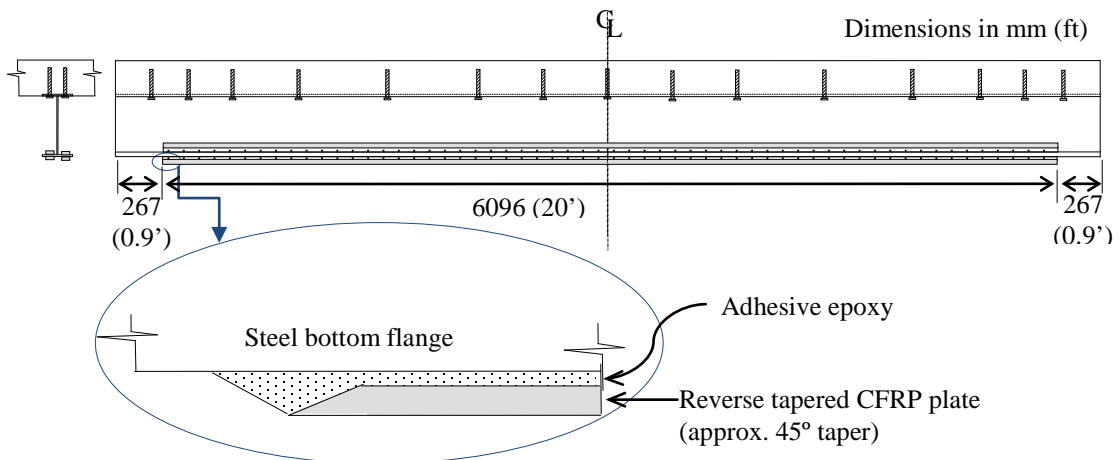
Layout of UHM CFRP laminates on each girder
